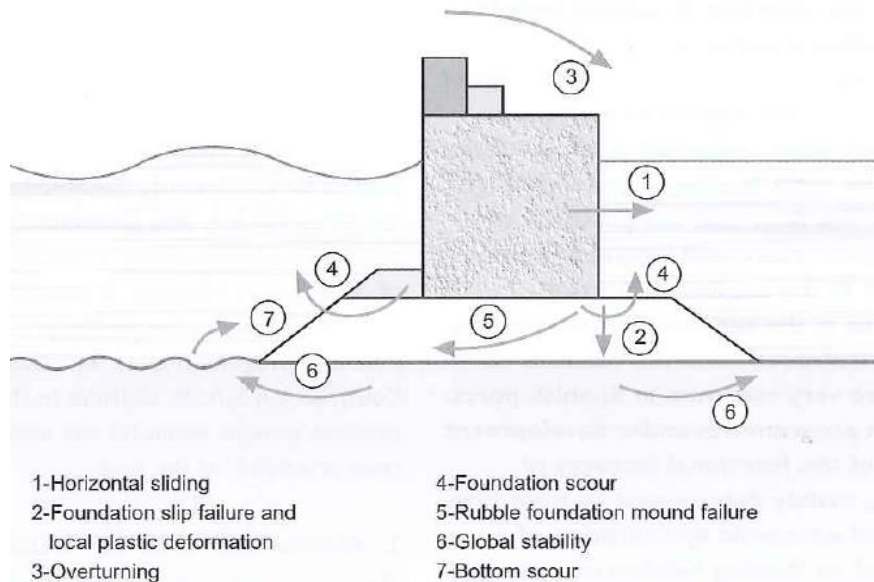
Geotechnical ultimate limit states for gravity caissons (after Esteban & Rey, 2009)
